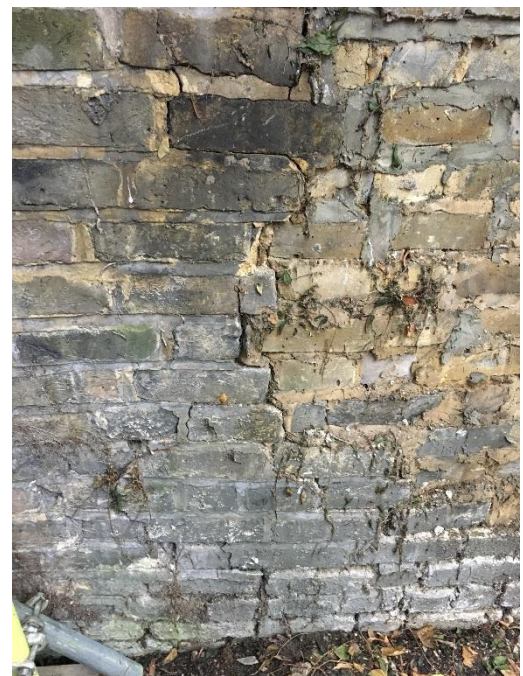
Illustrating cracked and bulging wall adjacent to T7.
